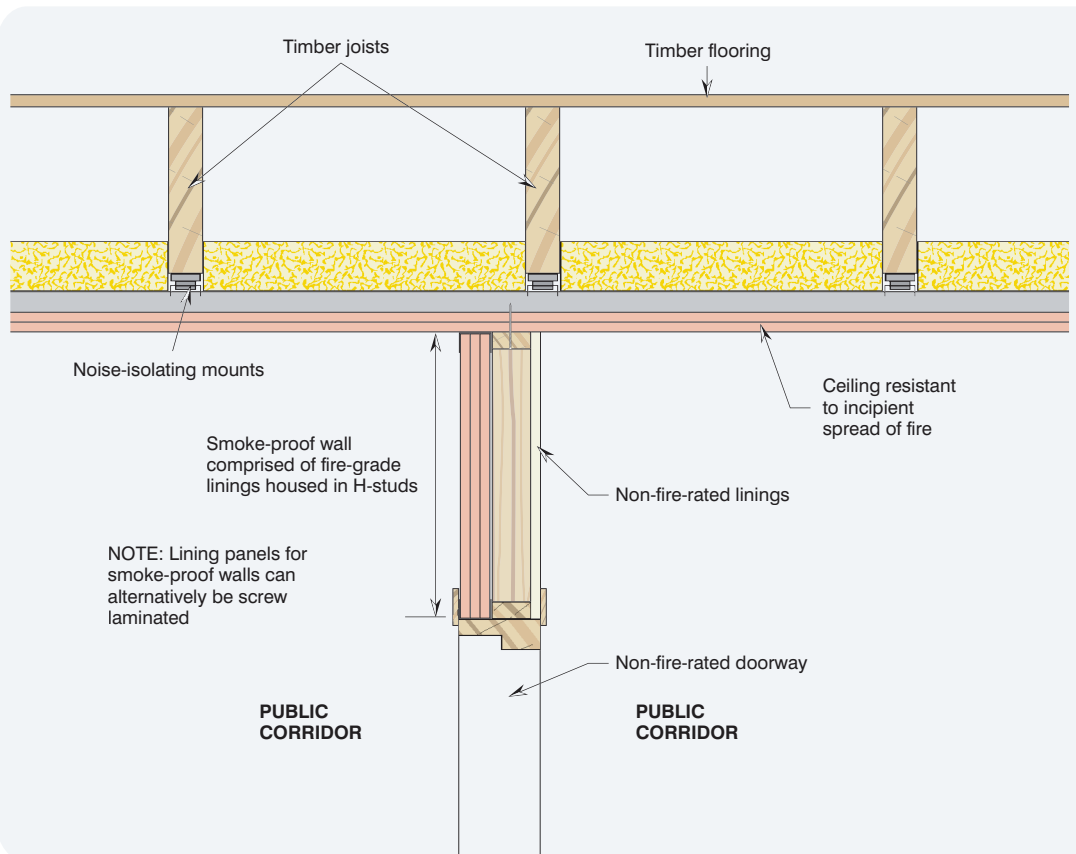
Smoke walls constructed out of fire-grade linings (only) – elevation view.
